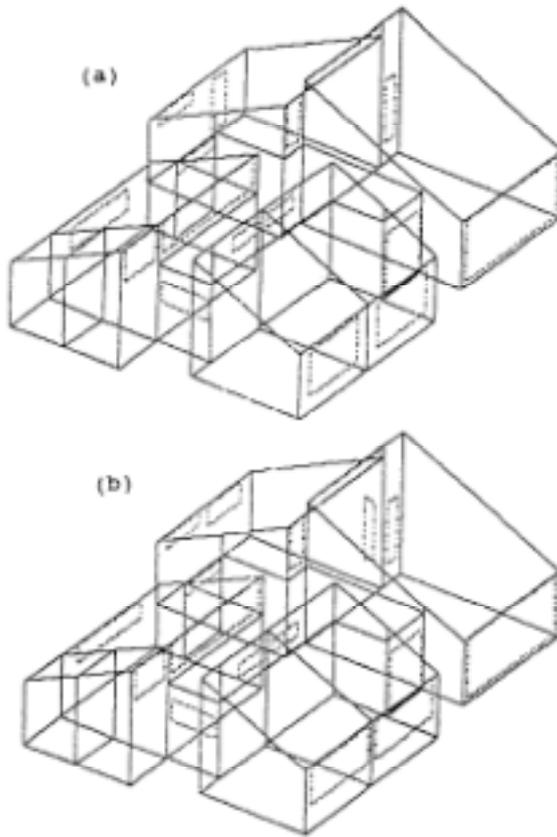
a. An axonometric view of alternative # 2. A new window is added to the Western elevation. b. An axonometric view of alternative # 3. A new window is added to the Eastern elevation.
